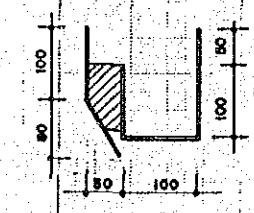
DETAIL OF CANAL IN ANAEROBIC TANK S = 1:20
